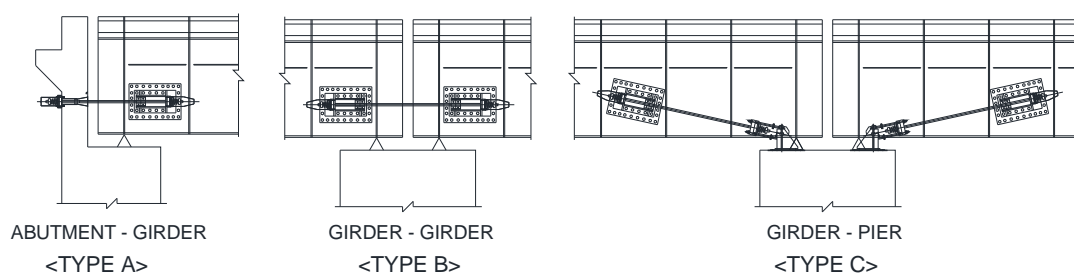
Installation Example of Bridge Unseating Preventive Structure
